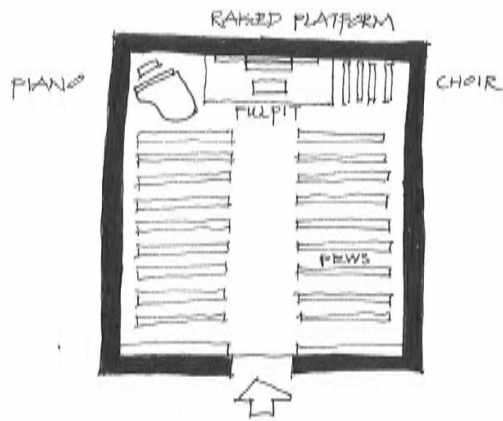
Typical Layout of Protestant Church in Hong Kong
